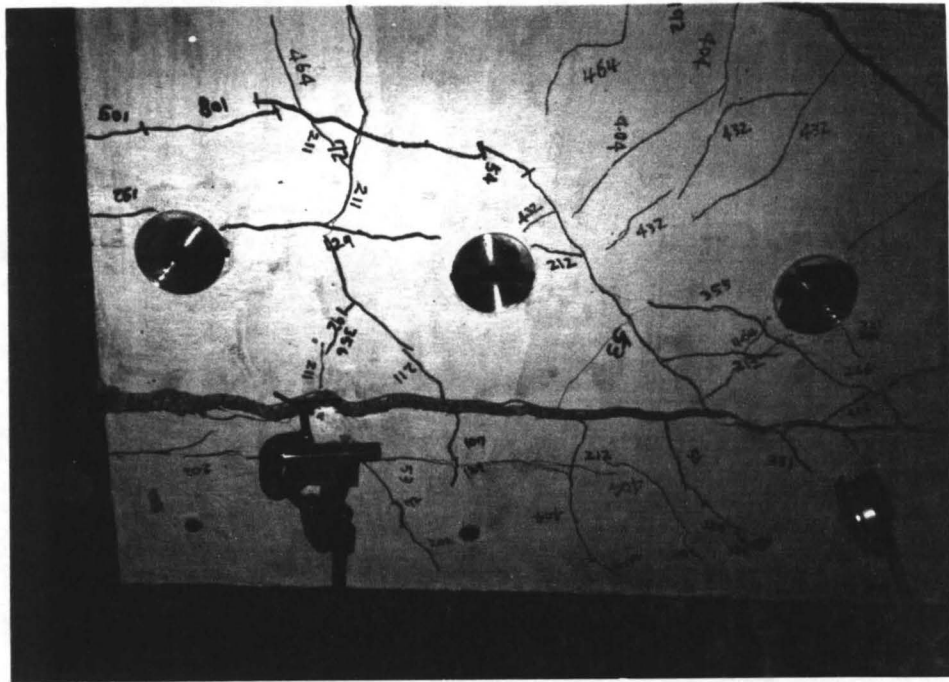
Slab Cracking Along the Support on the N. side
